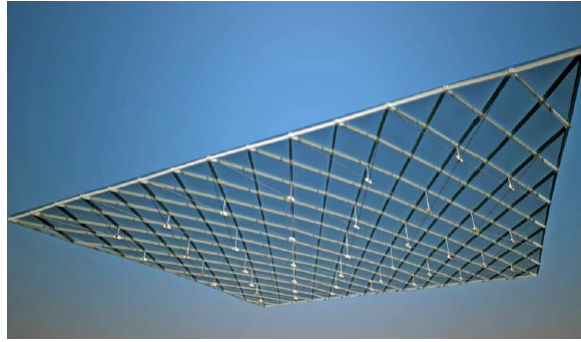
The proposed roof structure with glass panels supported on steel members with tension rods below. Figure taken from [17]
